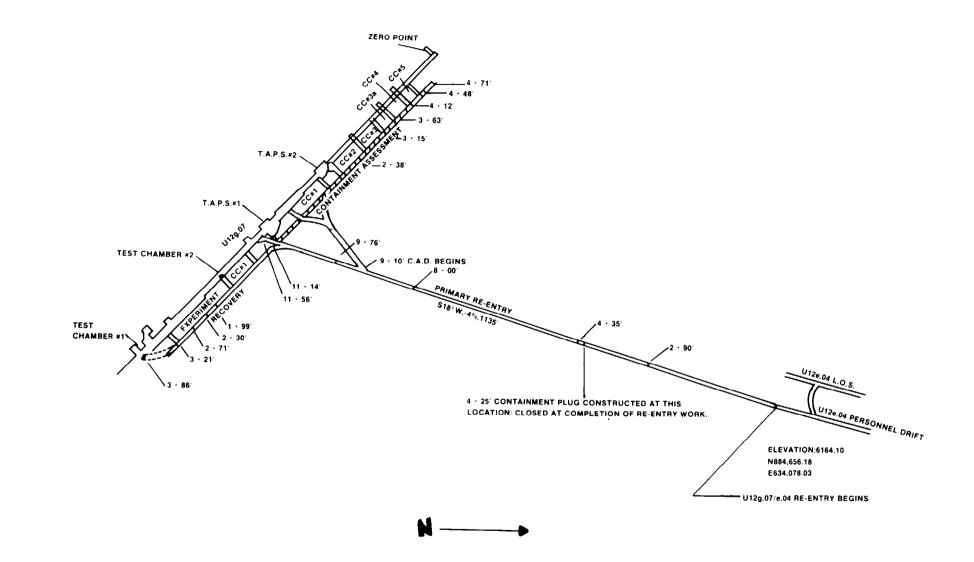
DOOR MIST event - postevent tunnel layout.
